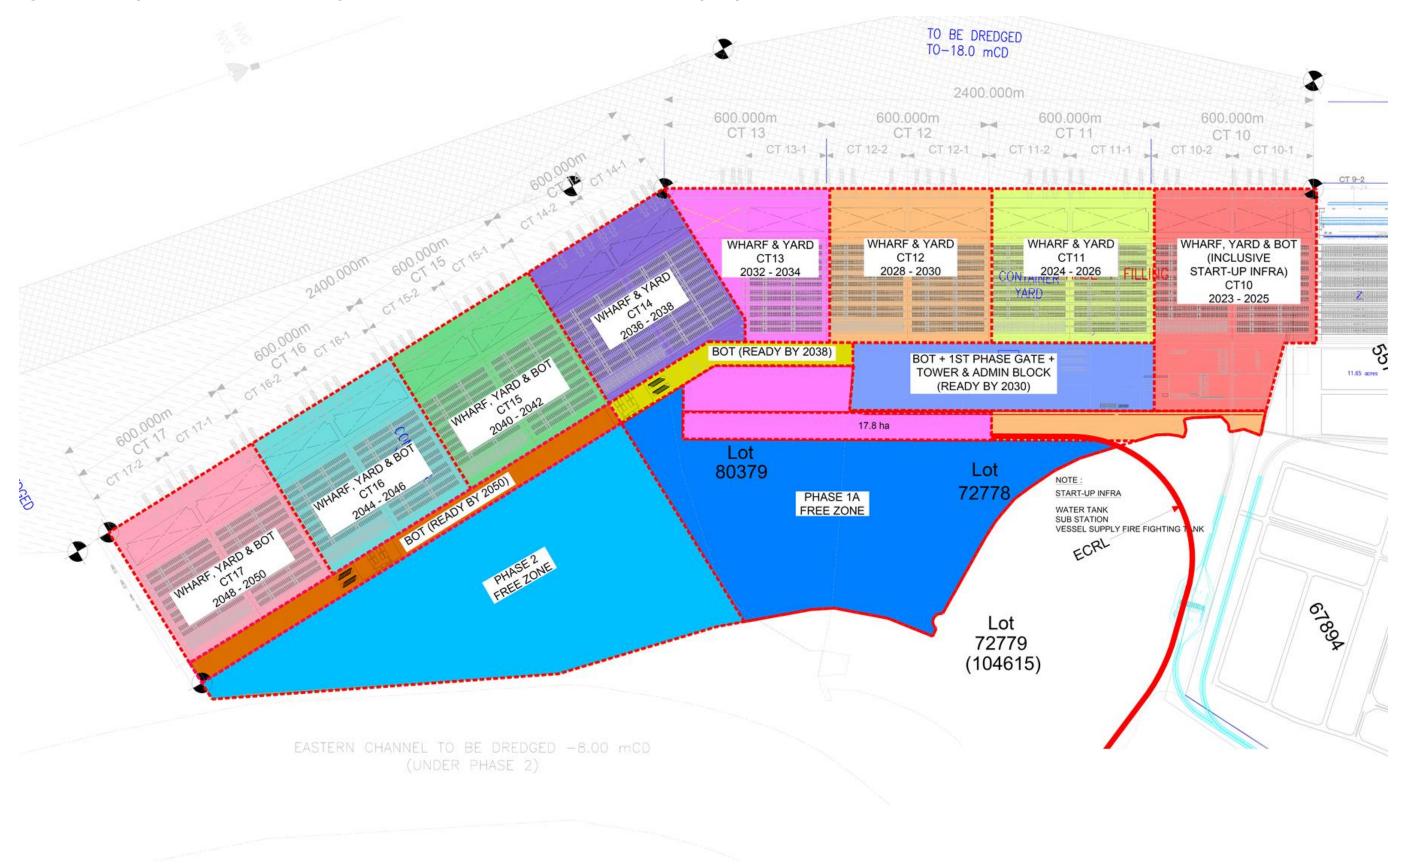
Proposed Construction Phasing Plan For Wharves, Yard and Back-of-Terminal (BOT)
